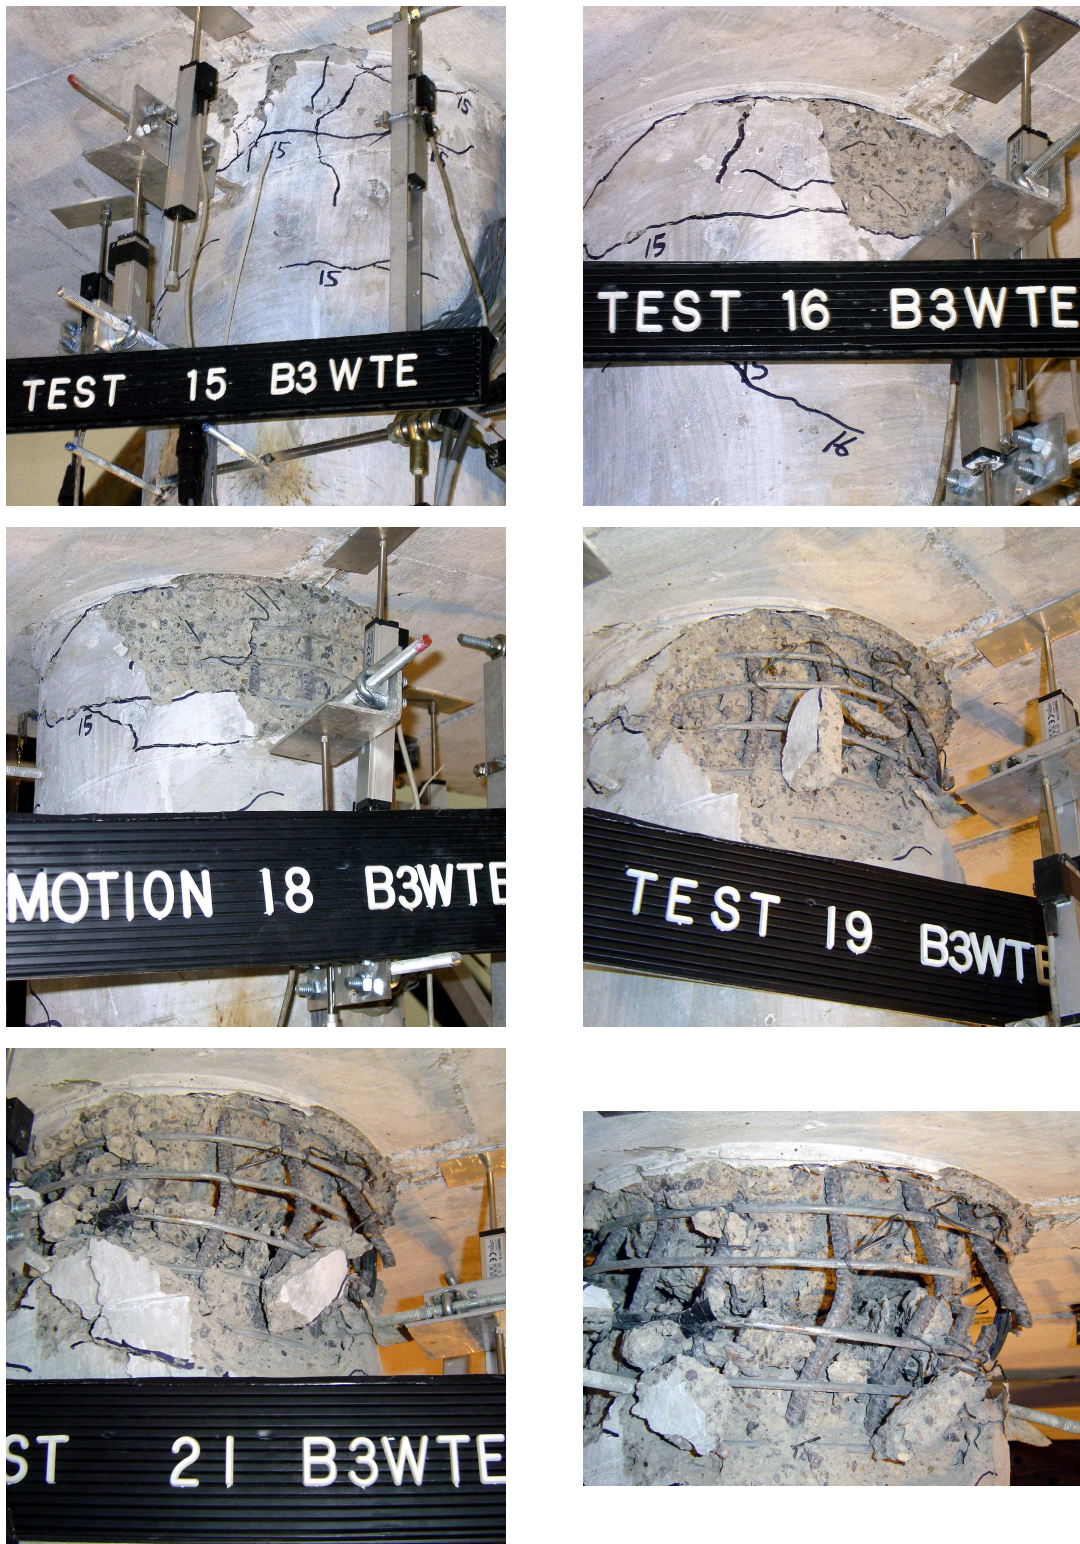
Damage progression at the east face of the top of the west column of bent 3: (a) cracking and flaking, (b) spalling, (c) exposure of longitudinal and transverse reinforcement, (d) buckling of longitudinal reinforcement and fracture of the transverse reinforcement, (e) fracture of the longitudinal reinforcement, and (f) total damage after testing.
